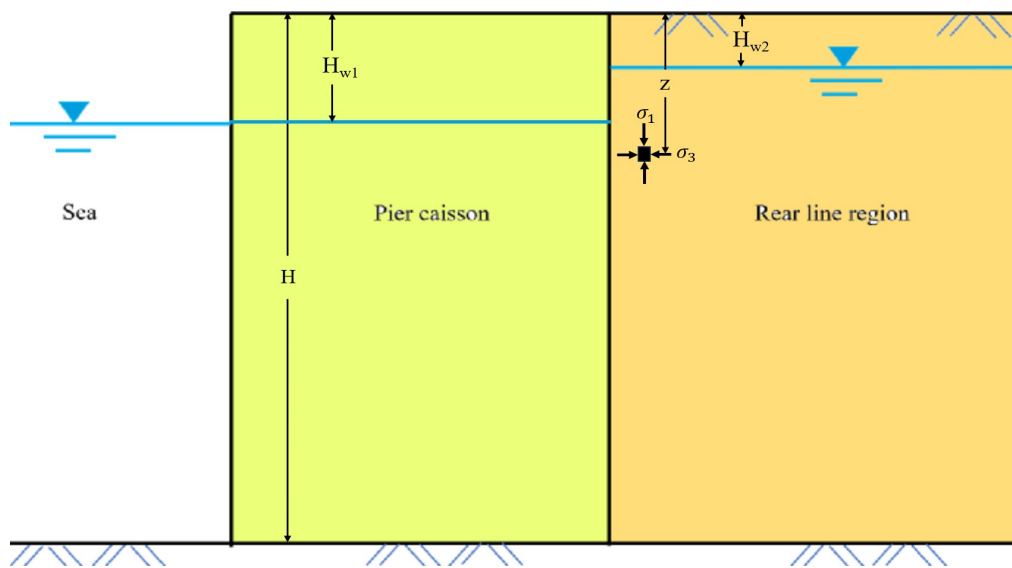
Schematic diagram showing the maximum and minimum principal stresses acting on an element within the soil layer behind the pier caisson-type retaining wall at Taichung Port, Taiwan.
